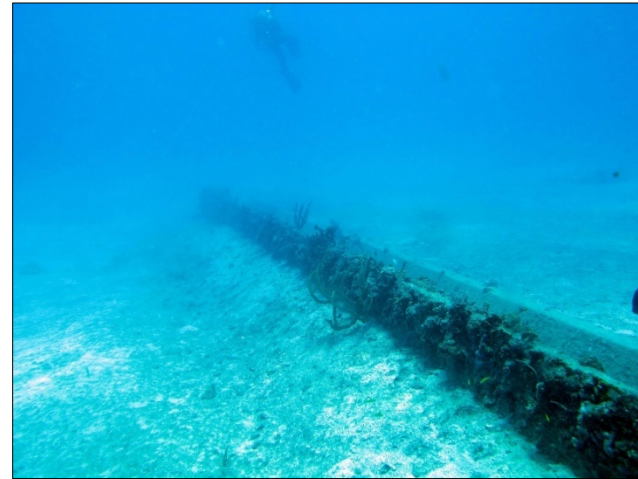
Concrete girder on seafloor near south margin of 300-m buffer.
